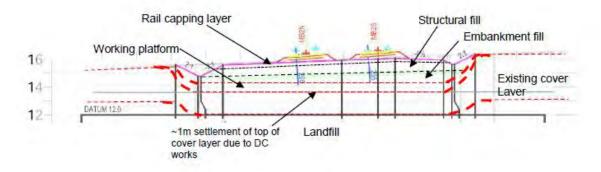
Rail embankment and subsurface layers at Ch 40,680
